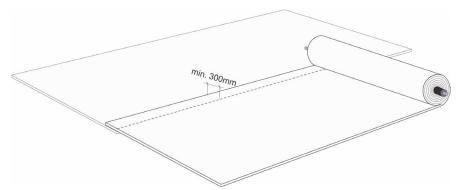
Typical overlap joint for Mirafi® high strength reinforcement geotextiles in the cross direction of the geotextile
